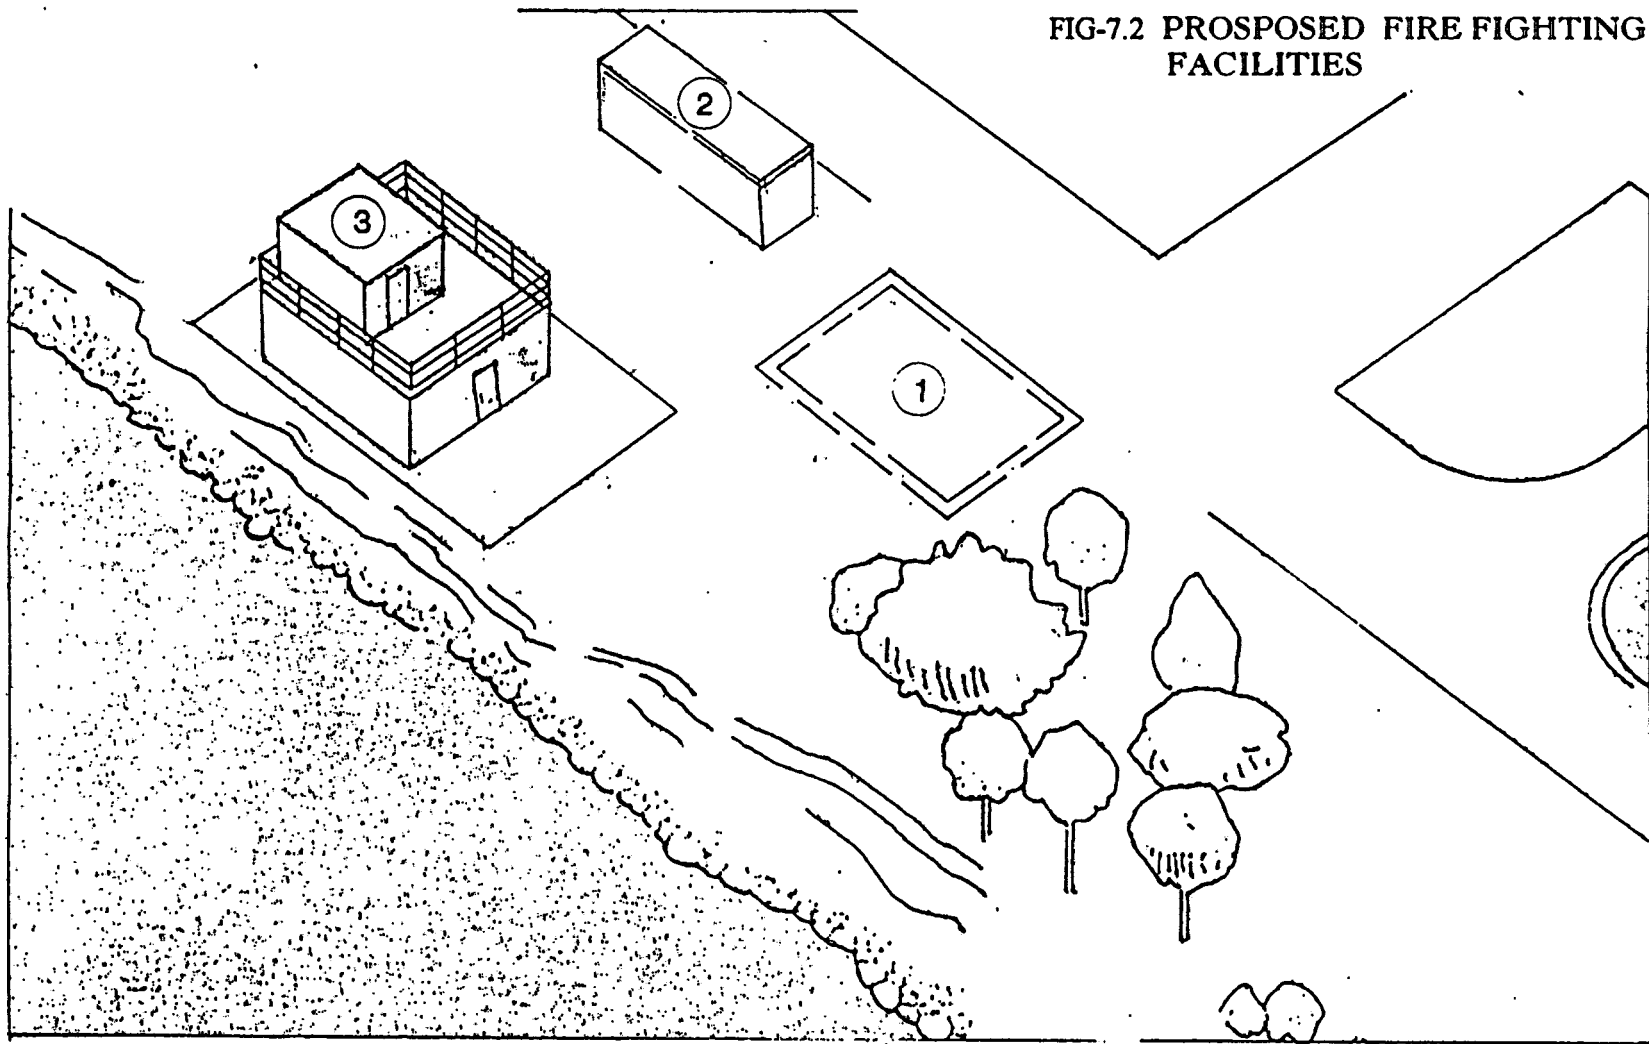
PROSPOSED FIRE FIGHTING FACILITIES
